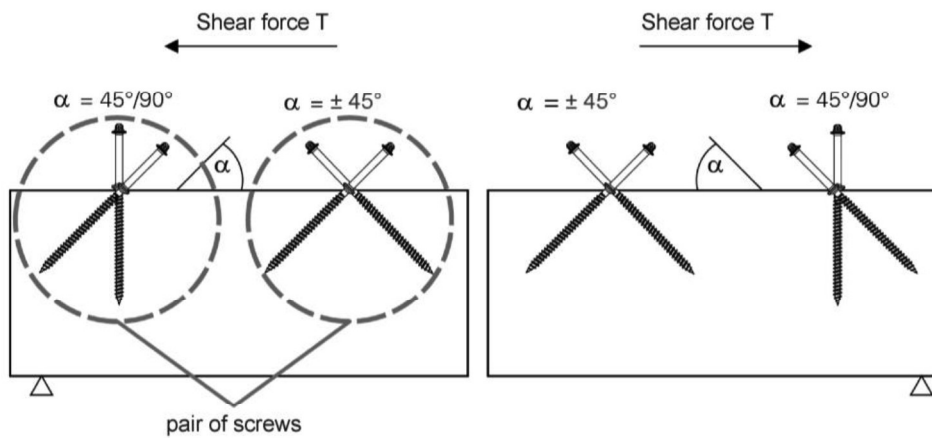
Arrangement of SFS VB screws in wood-concrete composite slabs kits
